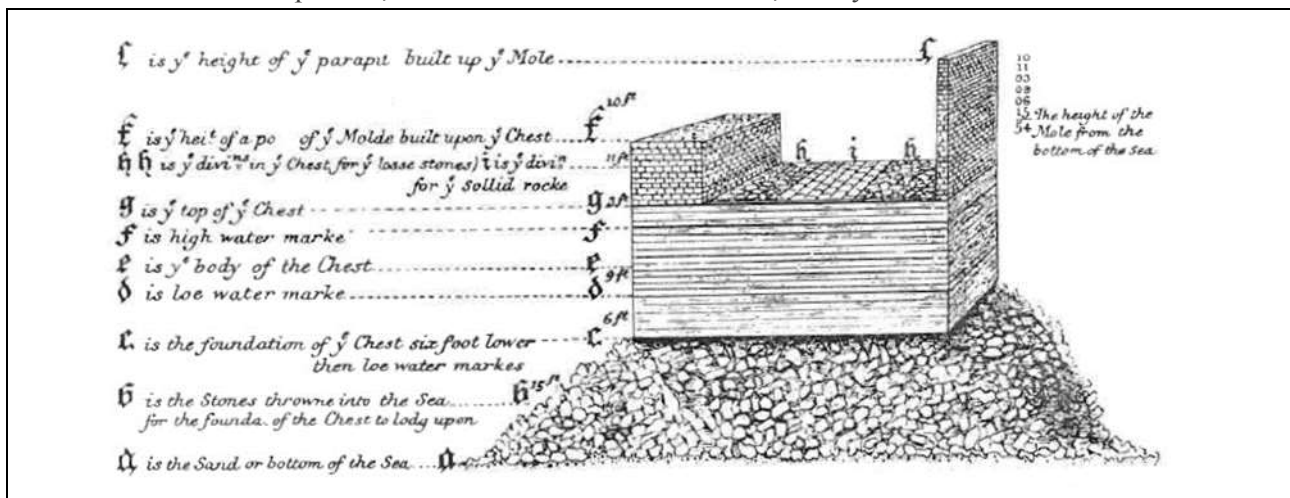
The Great Chest constructed by Mr Shere, June 1677
